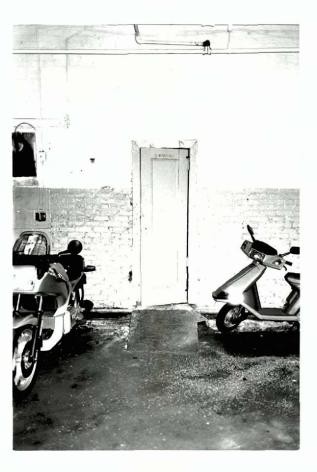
Existing two story garage on the Dublin House project area seen looking southeast.
